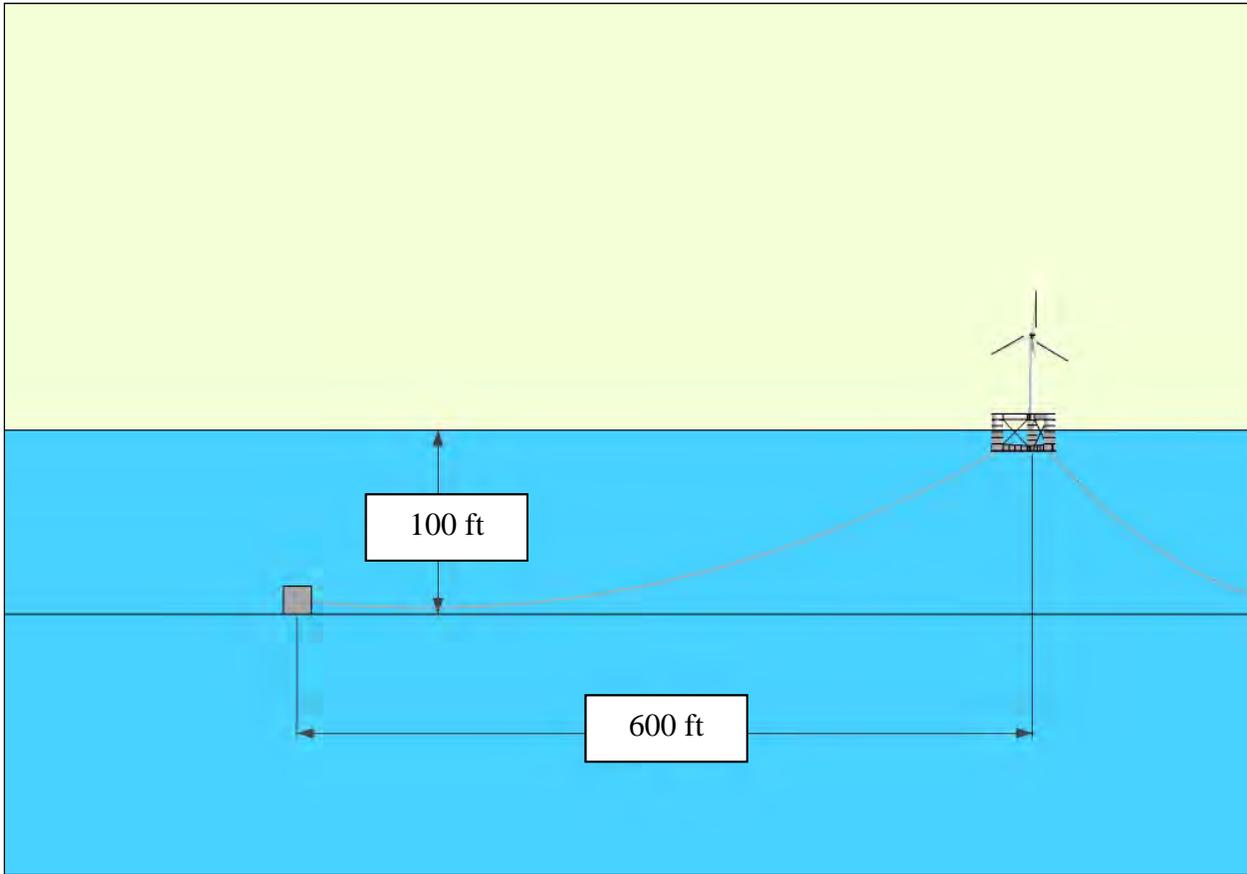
Elevation view of the proposed mooring line design (not to scale).
